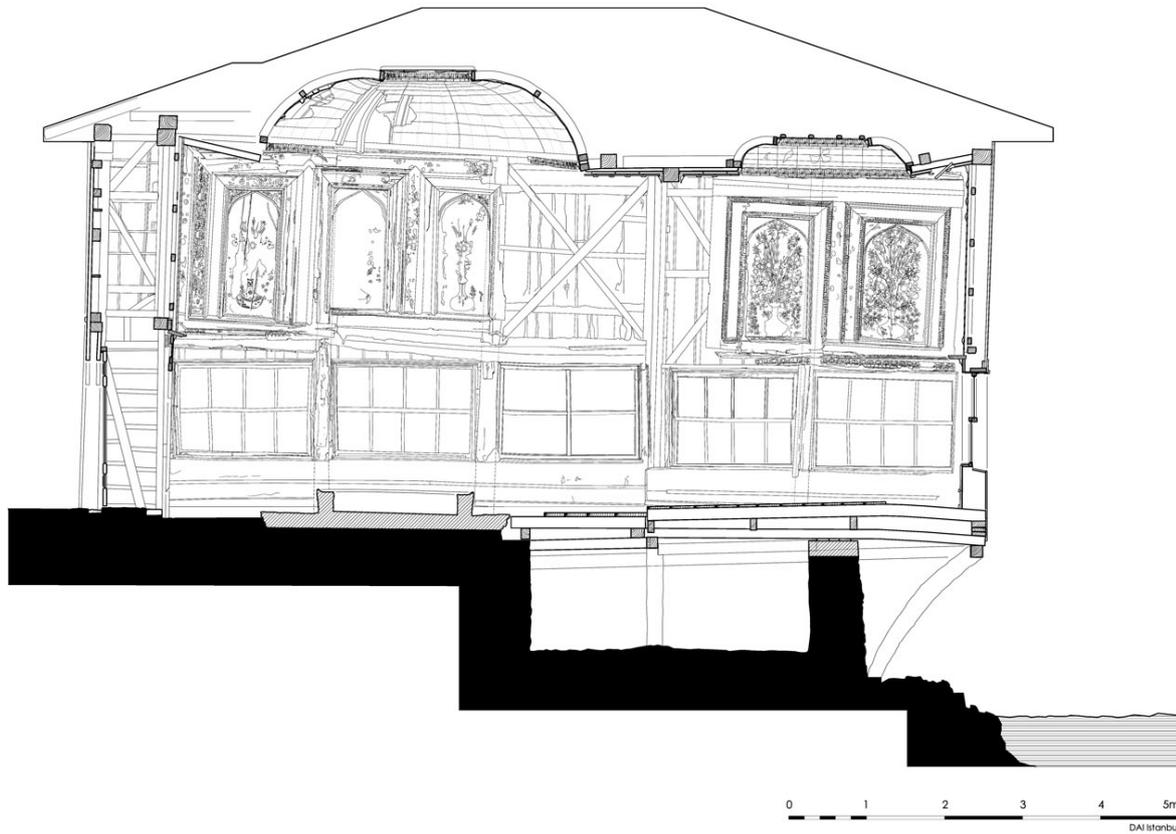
Cross-section through the Divanhane with view to the south, building documentation 2008; (Drawing Secil Tezer, DAI)
